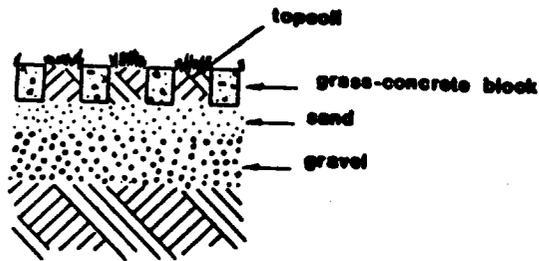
Permeable pavement with 'grass-concrete' surface.
